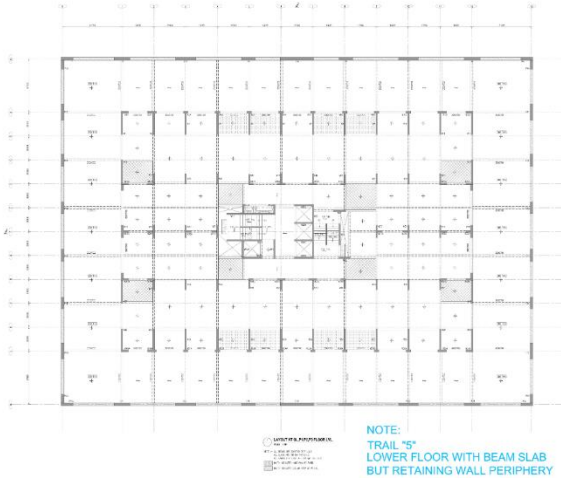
Lower floor with beam slab but retaining wall periphery (Trail:05)
